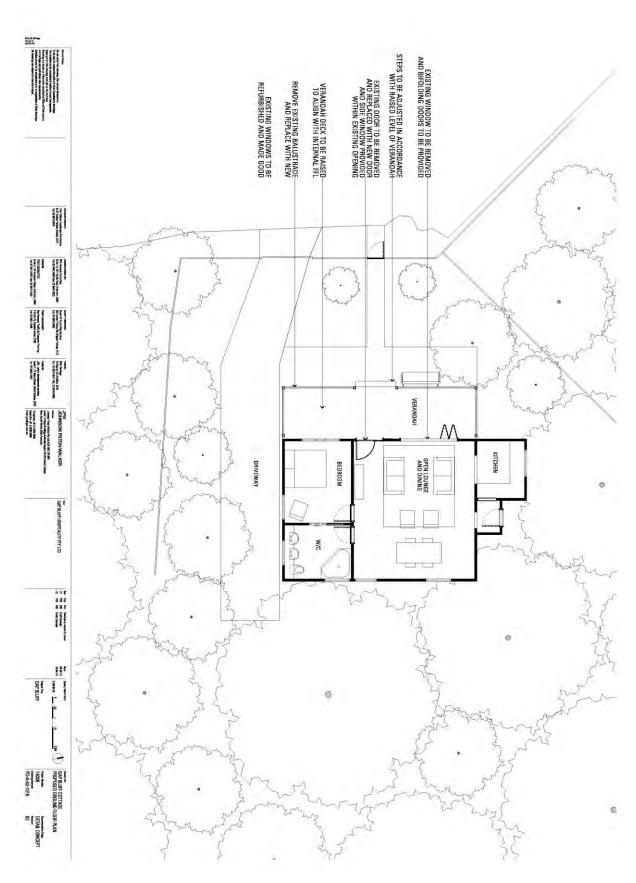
Proposed new floor plan for Gap Bluff Cottage. (Source: JPW 2015)
